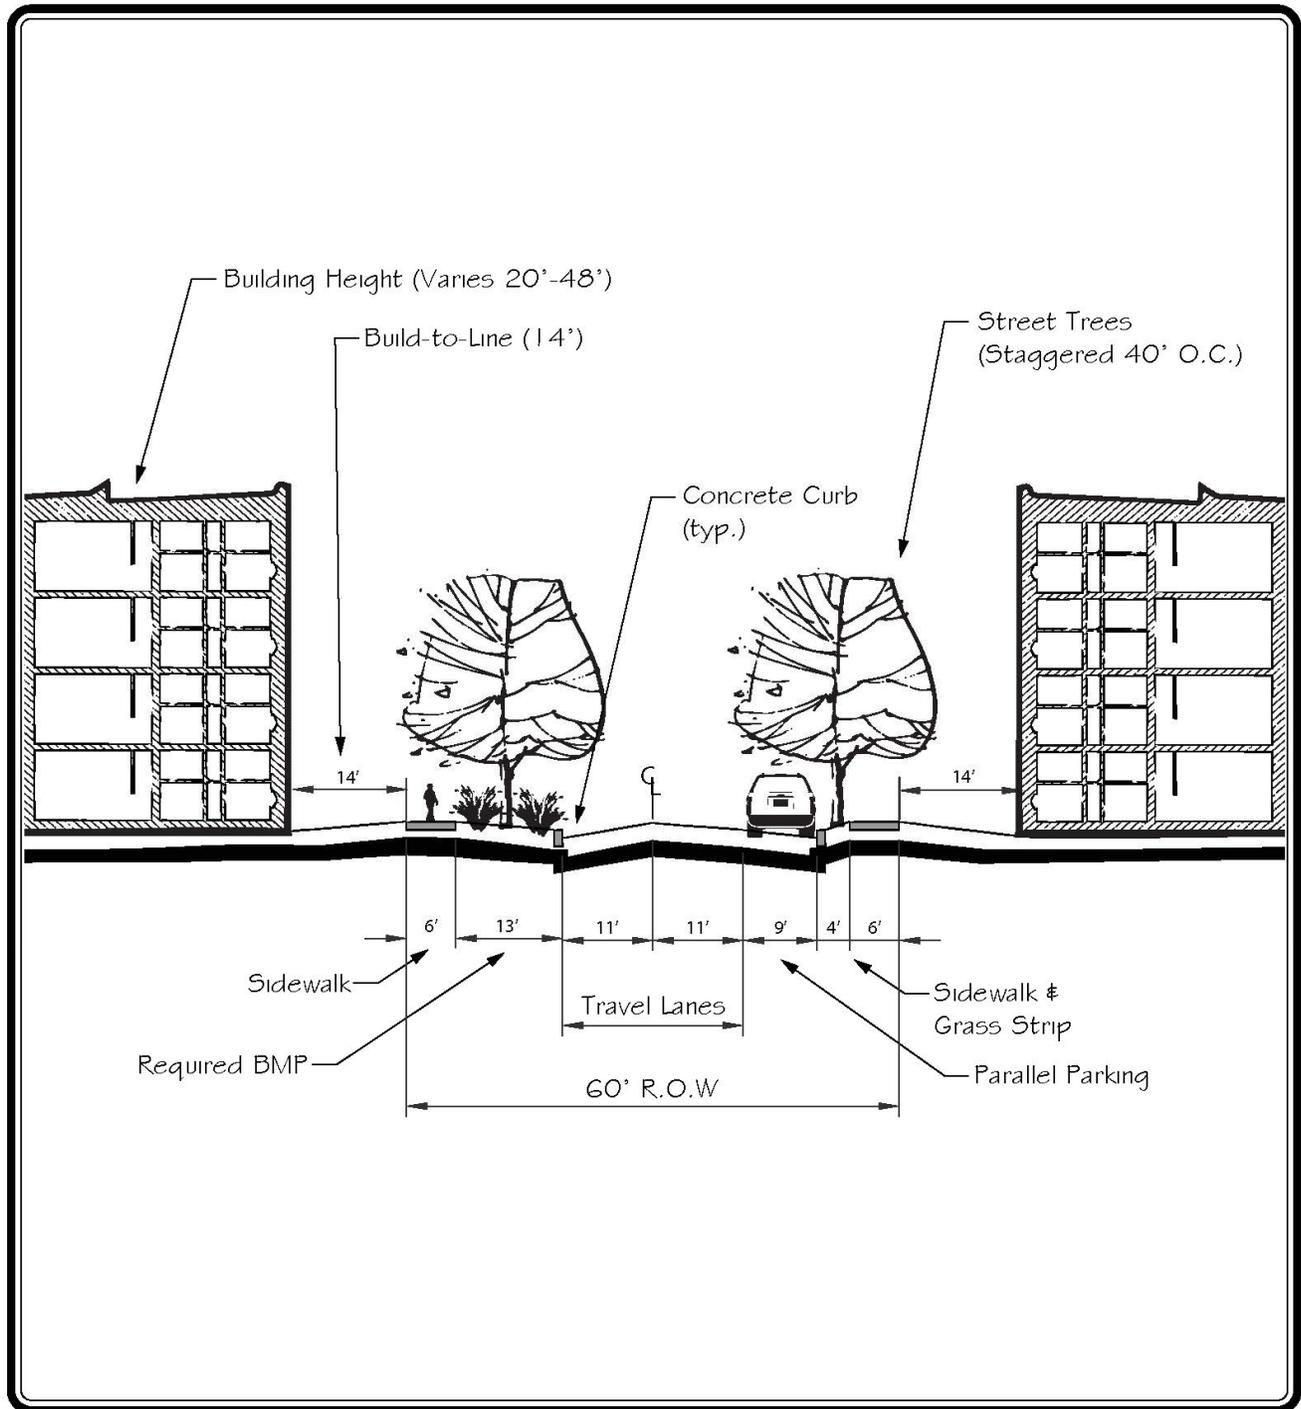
SECTION 314.05 – 03 TYPICAL COLLECTOR ROAD DETAILS WITH SINGLE-LOADED PARKING
